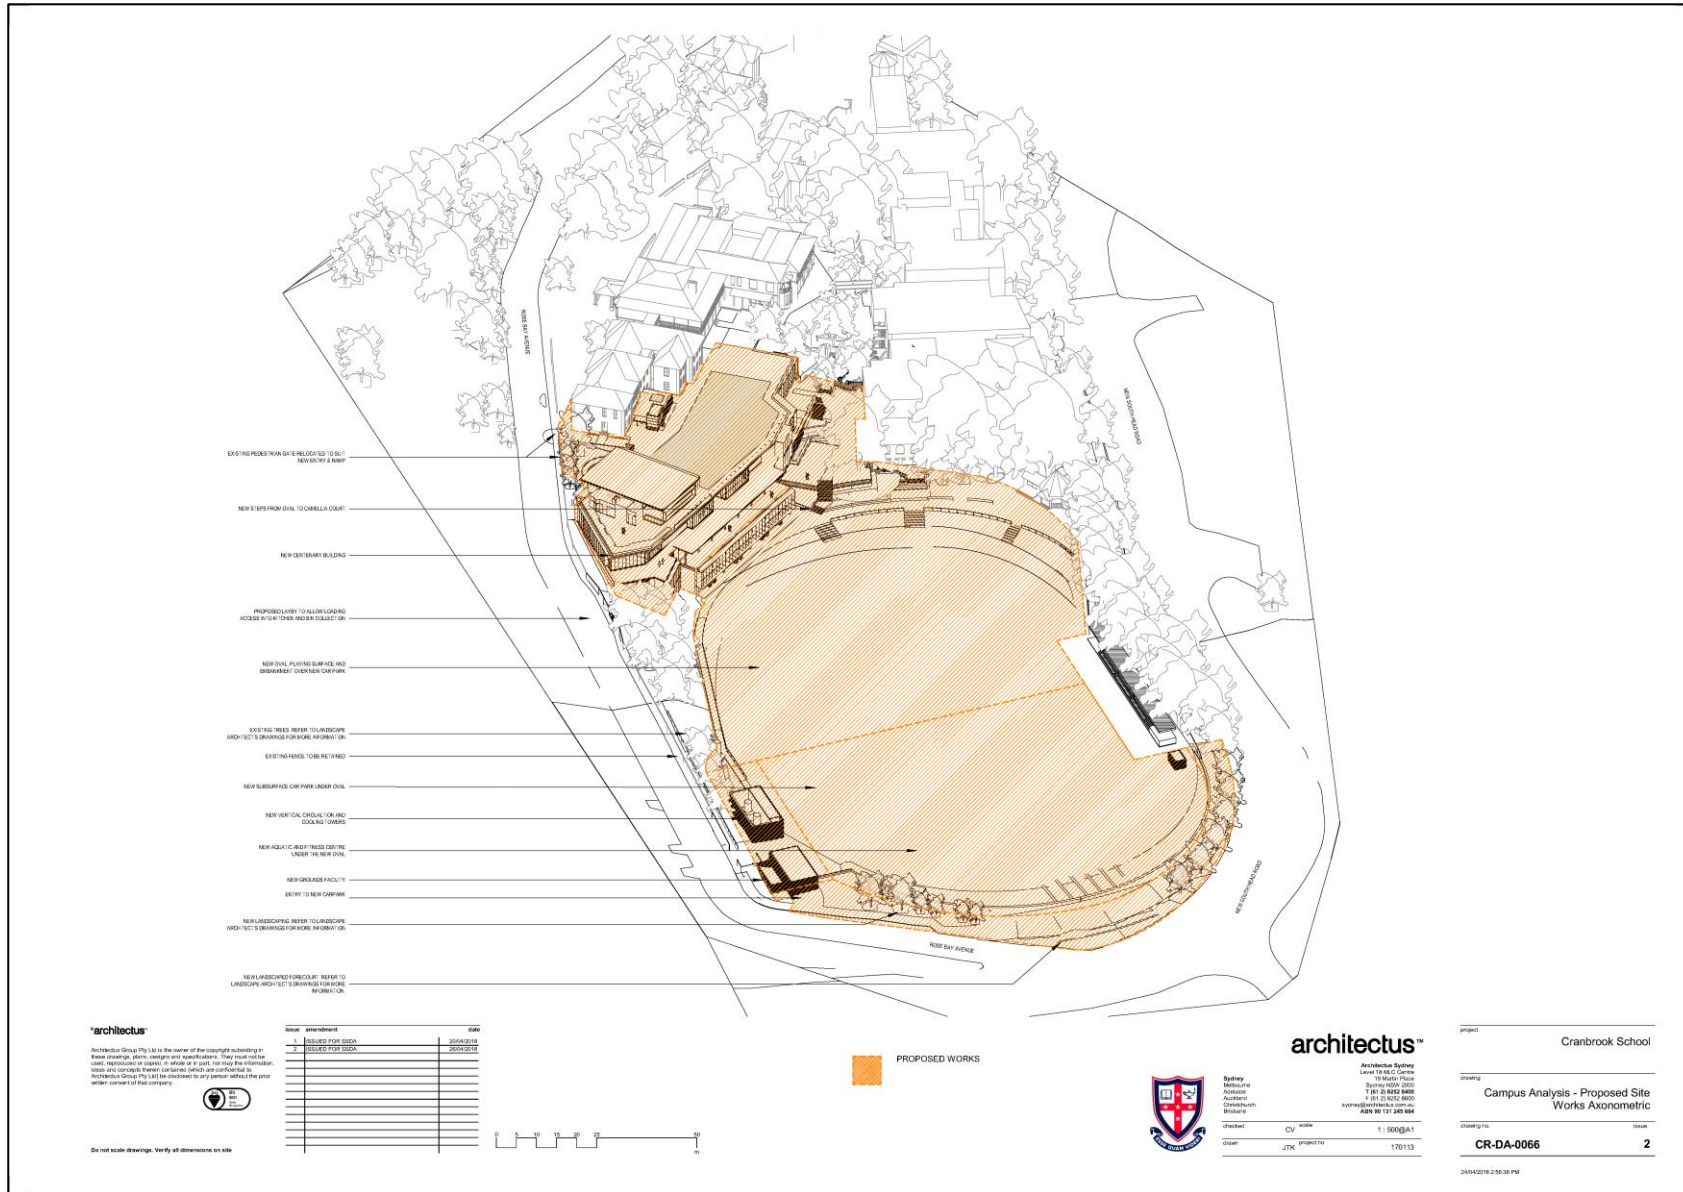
Showing the proposed works plan for Cranbrook (plan courtesy of architectus).
